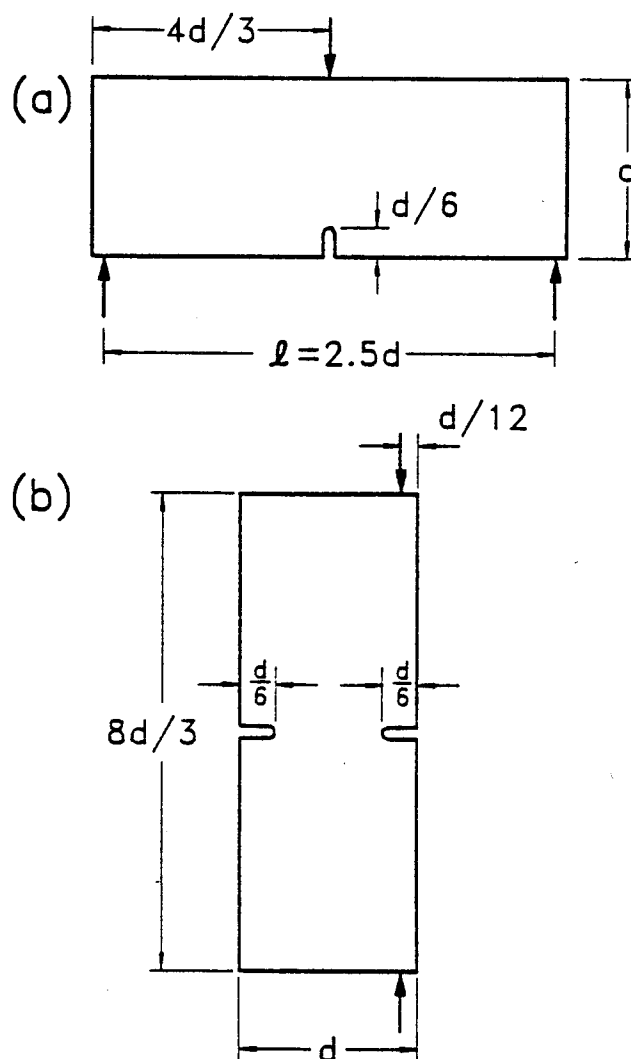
Test specimens used: (a) three-point bend specimens; and (b) eccentric compression specimens
